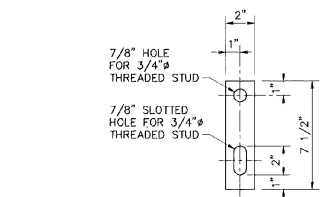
DETAILS FOR ATTACHING DOWNSPOUT TO MSE WALL PANELS
